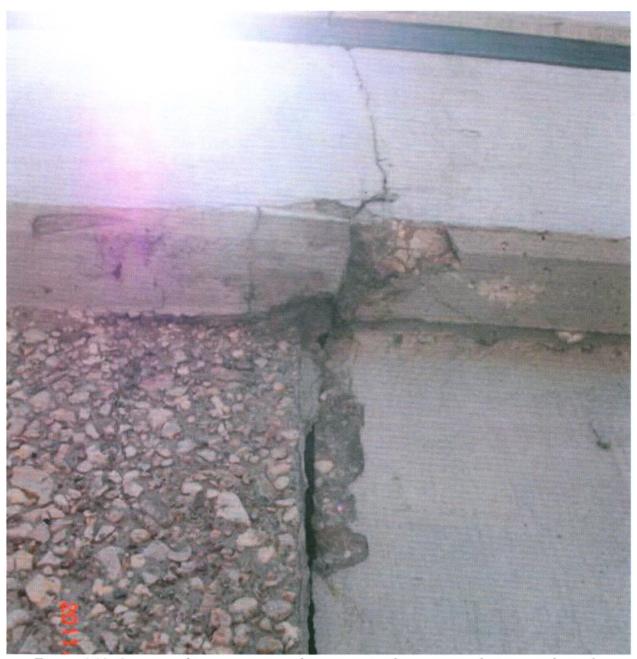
Some cracking was seen at the connection between two facing panels on the southwestern portion of the wall.
